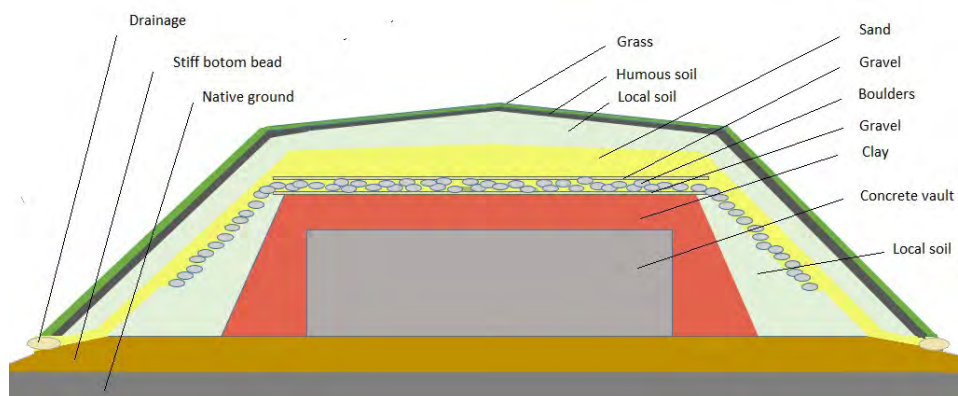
Closed NSDF with waste containers: cross section of concrete vault.
